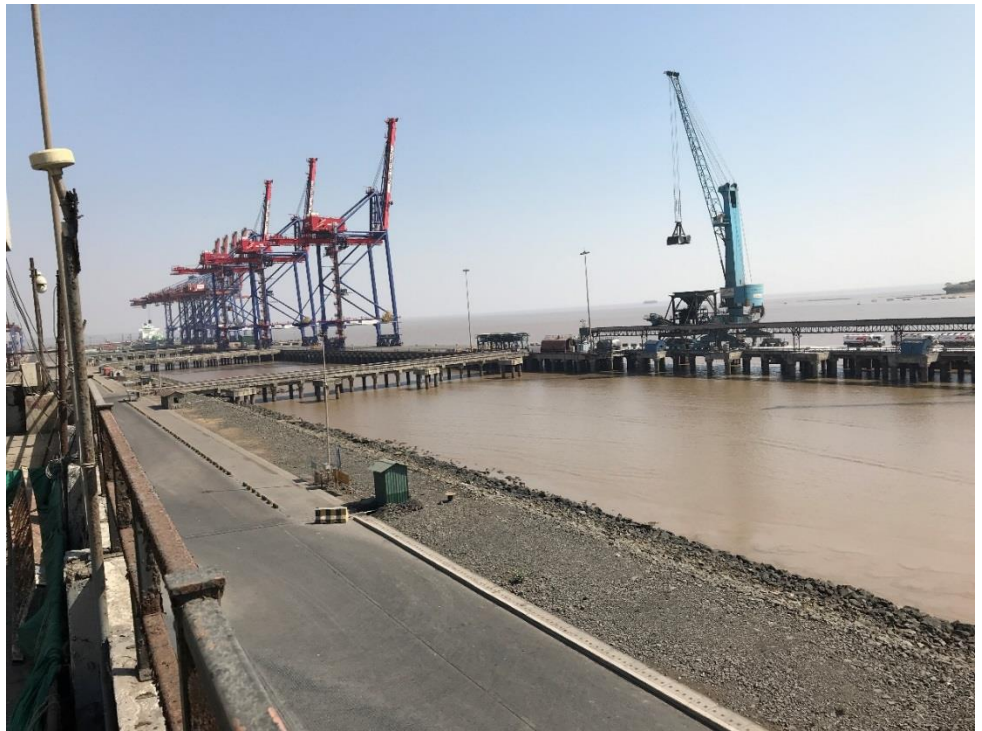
View of suspended pile deck and bridge connection to quay side
